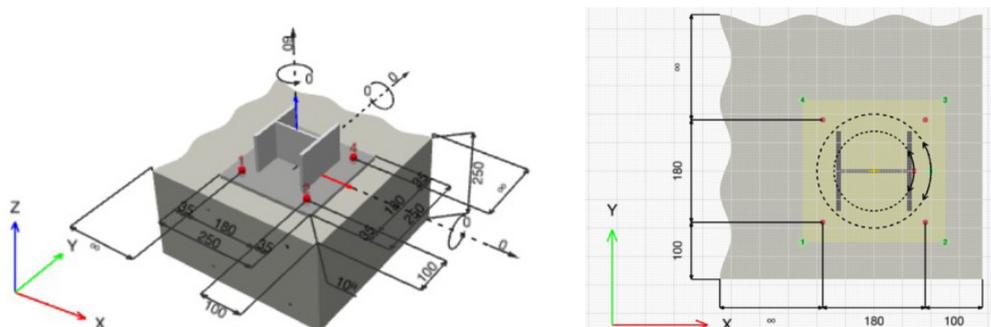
Baseplate connection using post-installed mechanical anchors
